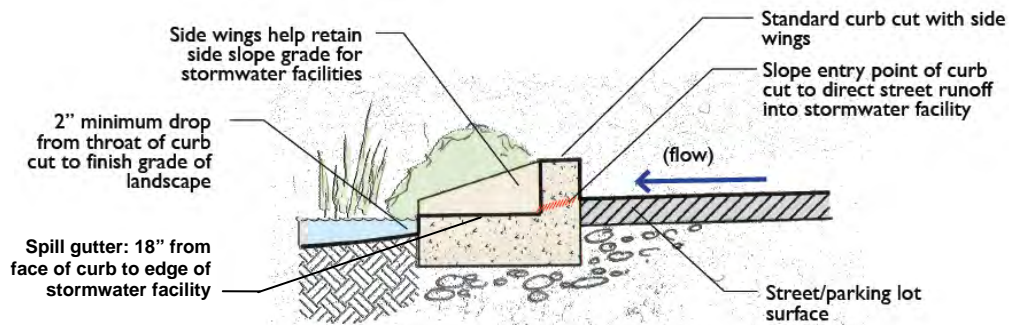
Standard curb cut with side wings: cut section view (Source: SMCWPPP 2009)
